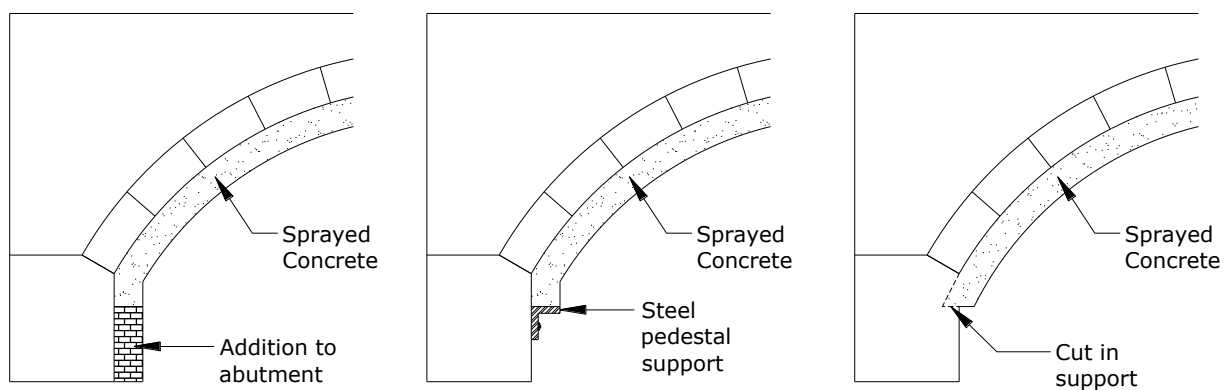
Providing additional abutment support for sprayed concrete arches.
